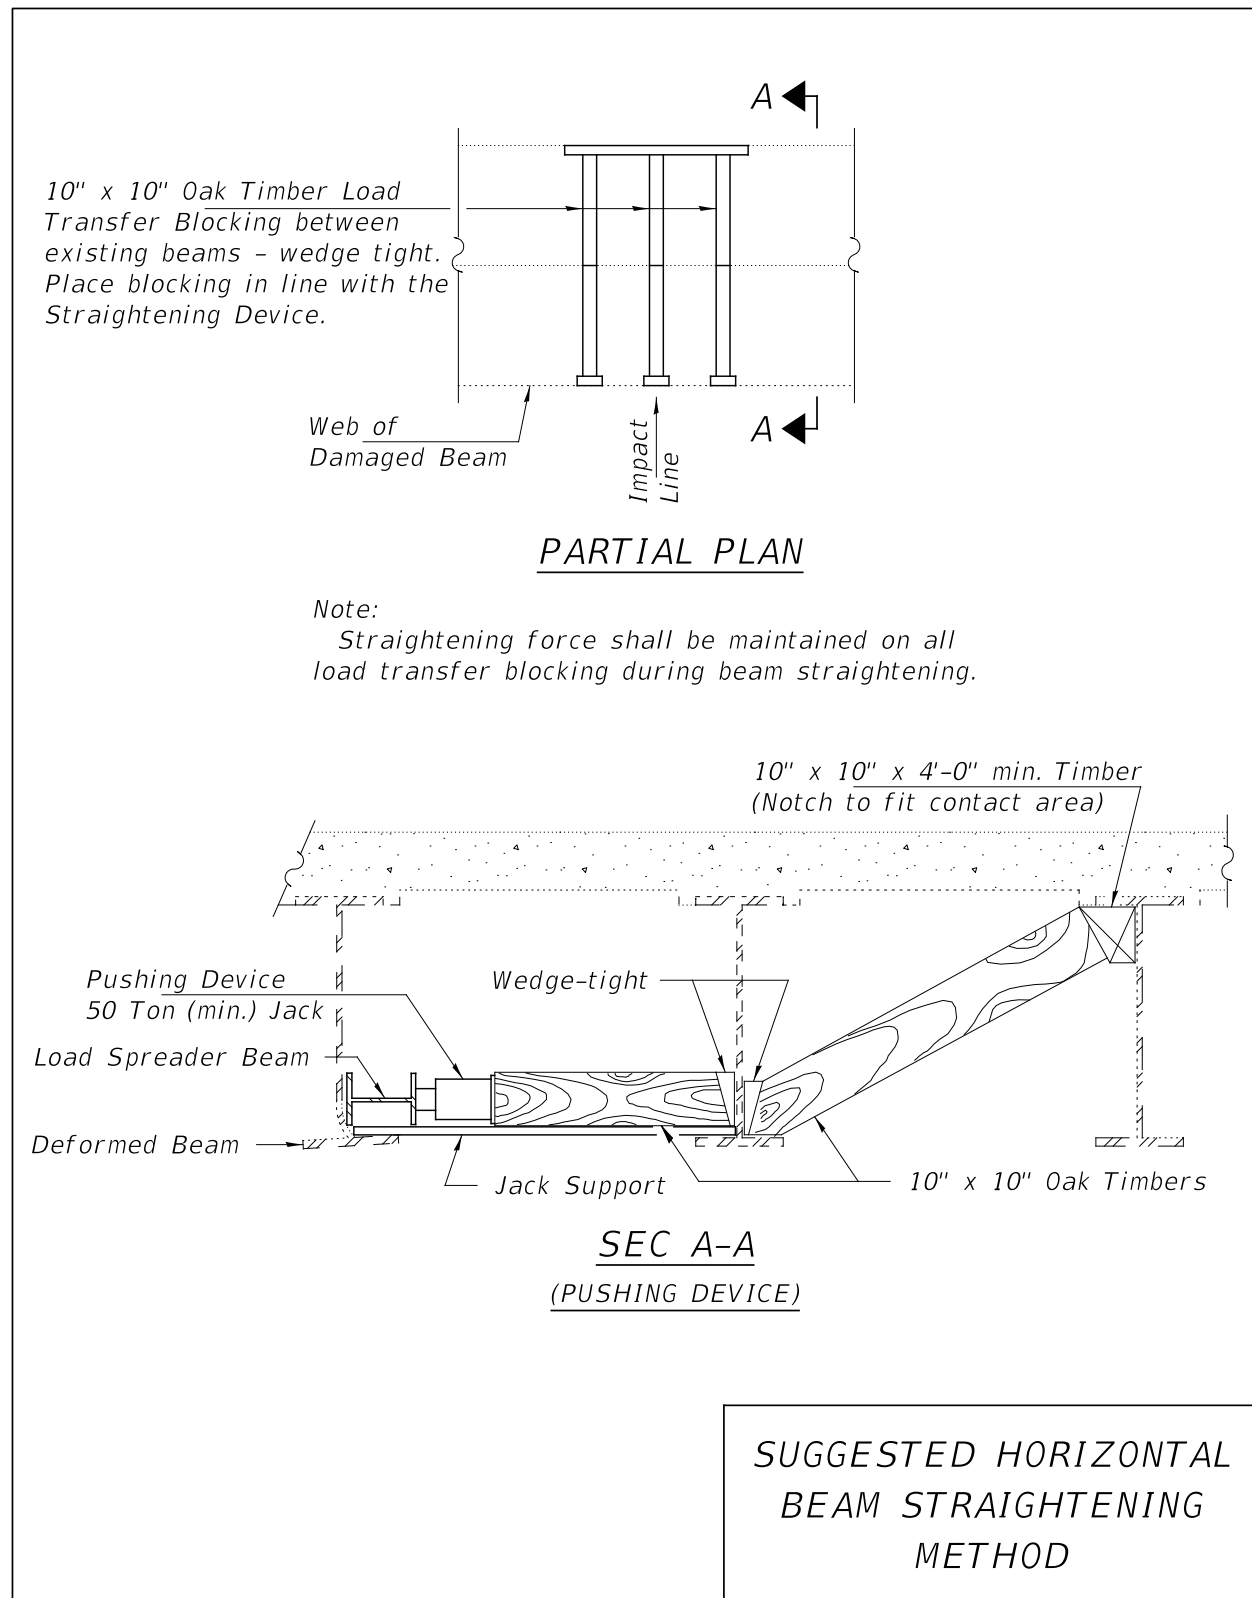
Suggested Horizontal Beam Straightening Method
